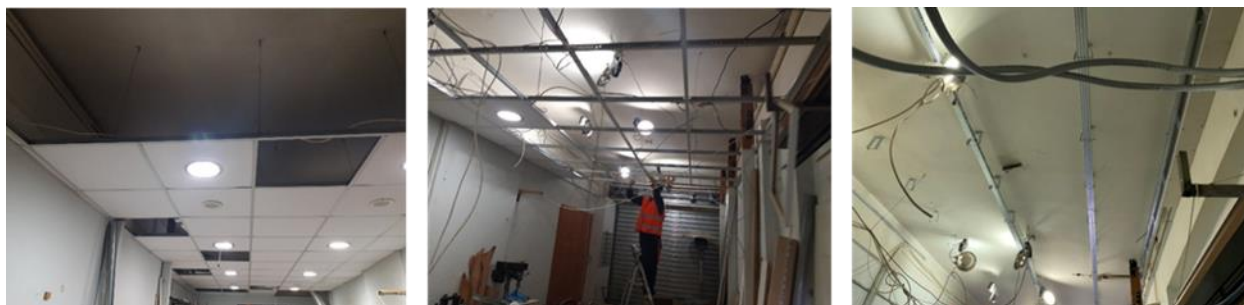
Deconstruction of the old false ceiling of the ground floor
